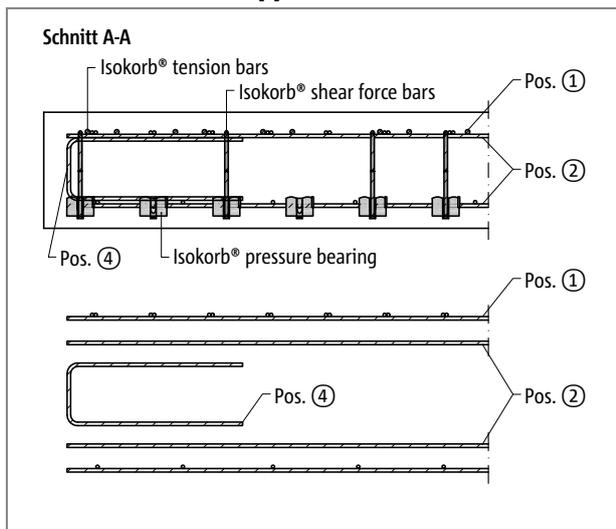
Schöck Isokorb® XT type K: On-site reinforcement balcony side in section A-A; Pos. 4 = side reinforcement on the free edge perpendicular to the Schöck Isokorb
